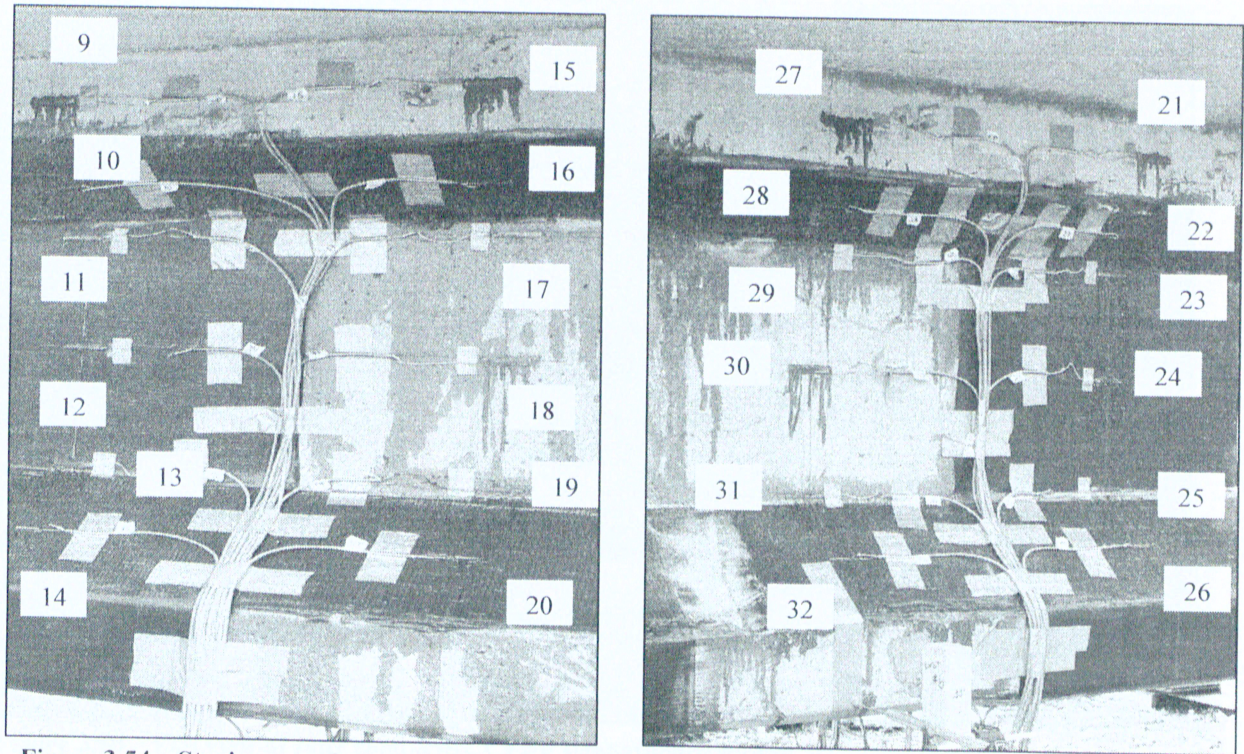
Strain gage placement on south (left) and north (right) girder faces
